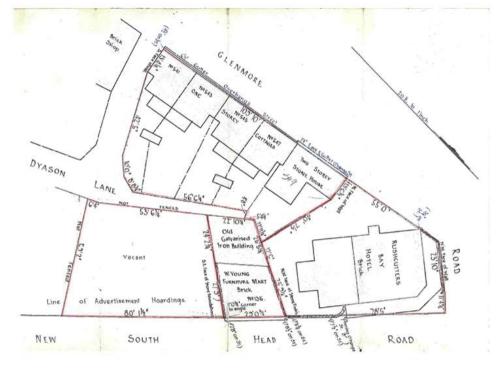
Survey certificate, Rushcutters Bay Hotel 133 New South Head Road, 541-549 Glenmore Road, 18 May 1955, showing the 8" encroachment over the New South Head Road road reserve. (Source: Anglican Archdiocese of Sydney Archives)
